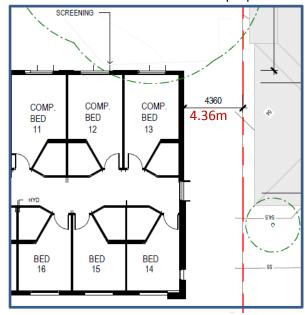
Extract First Floor Plan Source: Jackson Teece
